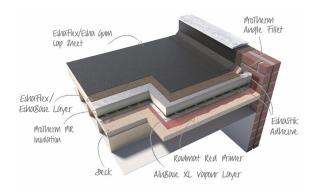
Radmat - Detailing of roof insulation + waterproof solution. Source: https://radmat.com/products/permaquik/
